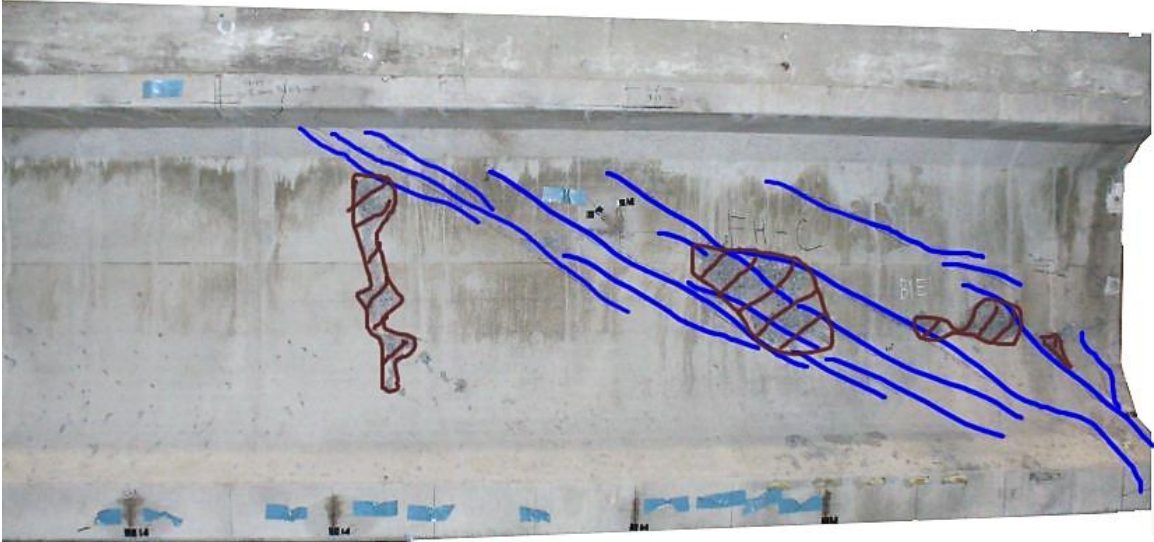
HC after load testing (cracks shown blue; spalling in brown)
